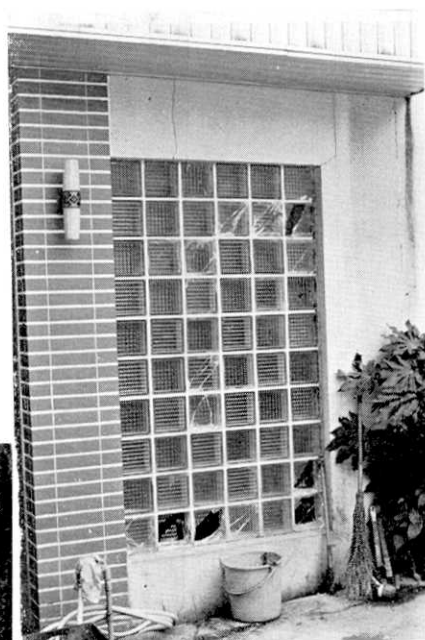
Failure of a ferro-concrete building at Yukawa.
